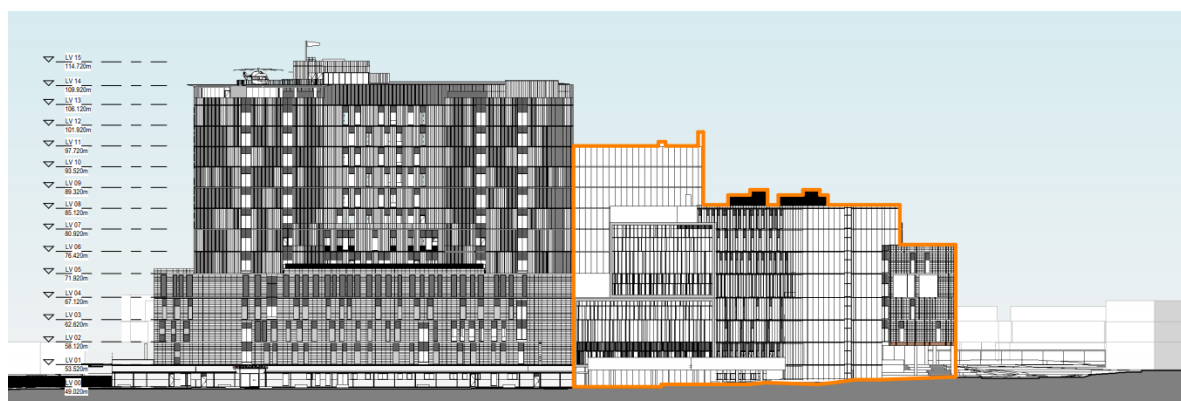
North Elevation – Stage 2 Tower outlined in red to right of Stage 1 Tower (BVN)
